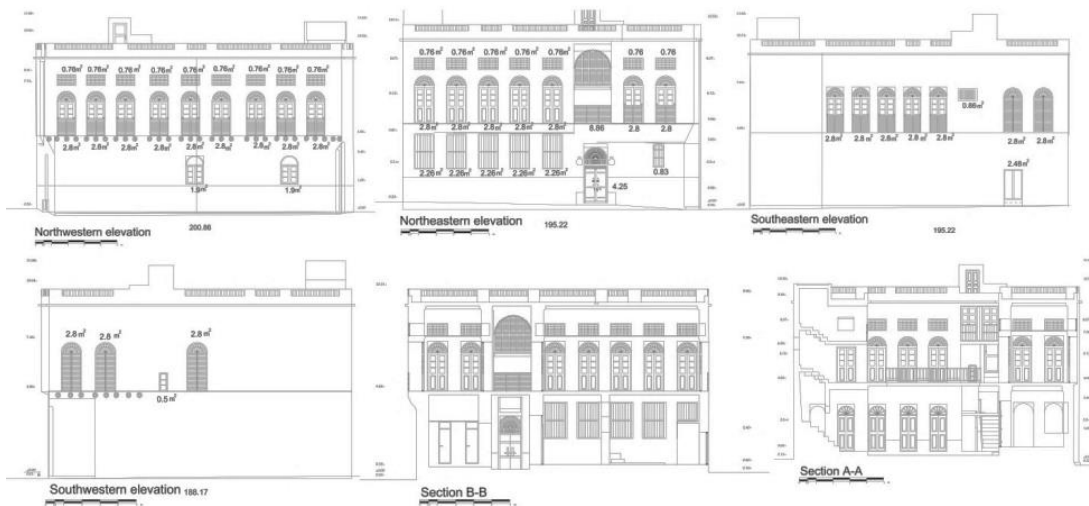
Elevations and sections of Rashidy house (drawn by authors)
